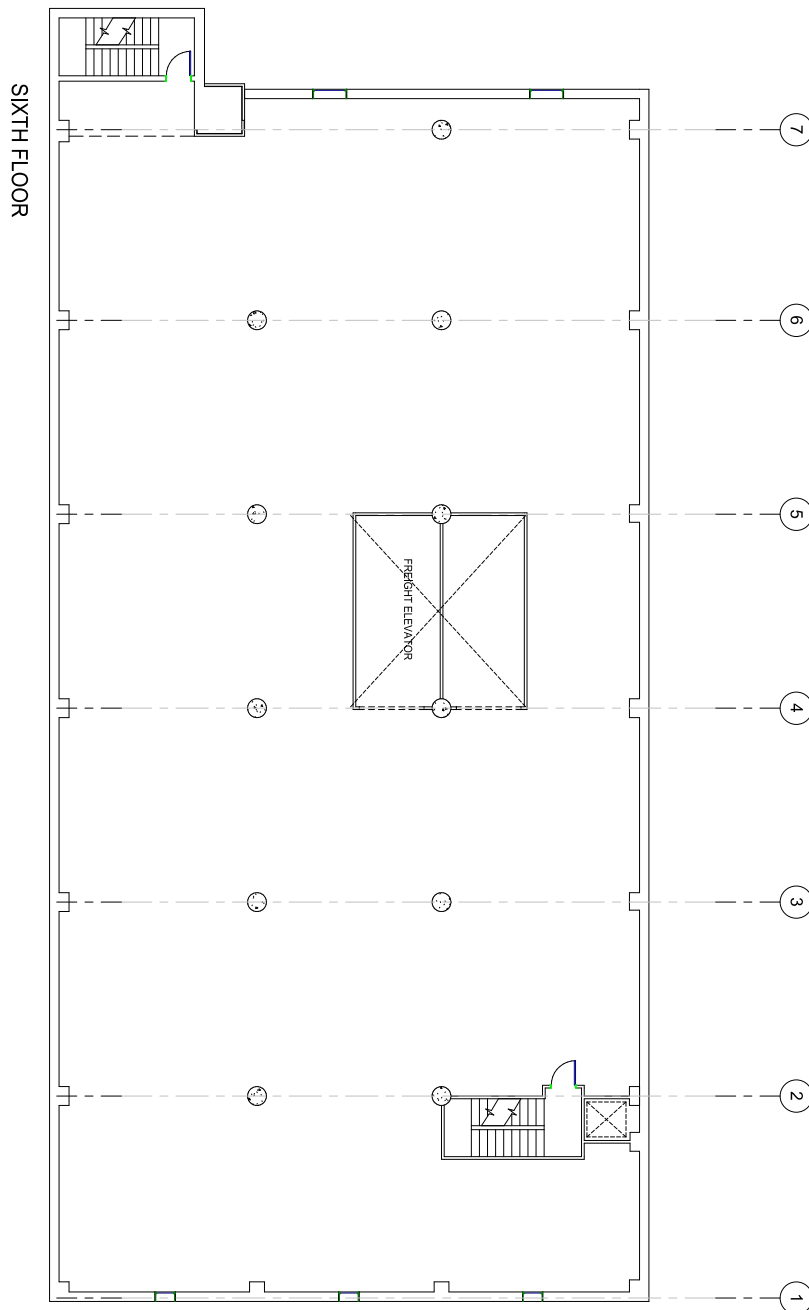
As-Built Sixth Floor Plan. (WILDESIGN Architects, 2018)
